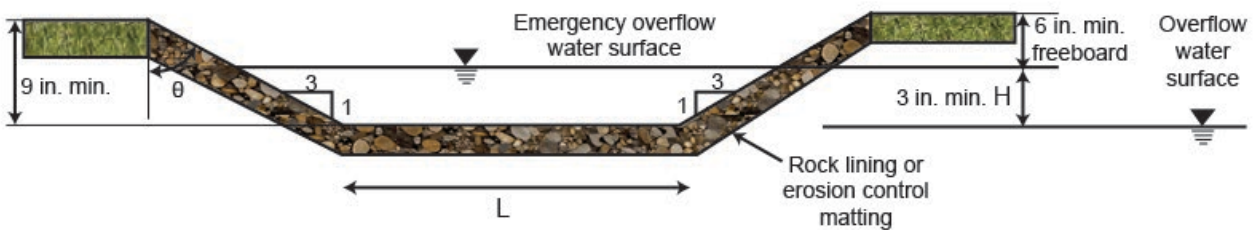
Weir section for emergency overflow spillway (adapted from King County 2009).
